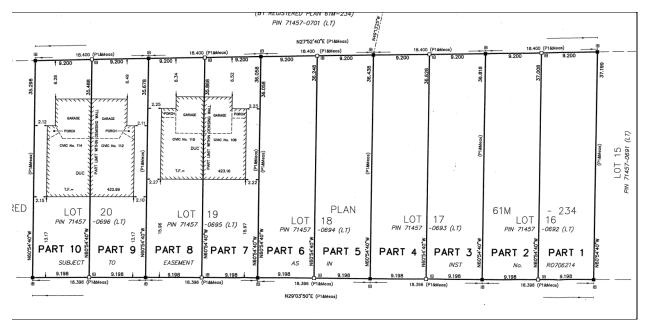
Draft Reference Plan (Source: BSR&D, 2020)
